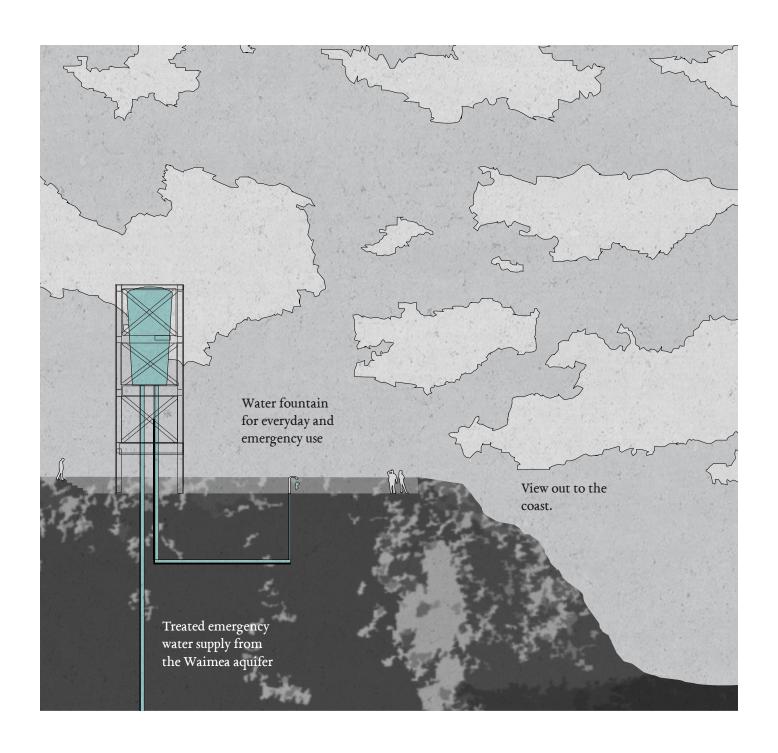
Section CC of Water tower 5 and Dunetop Park
